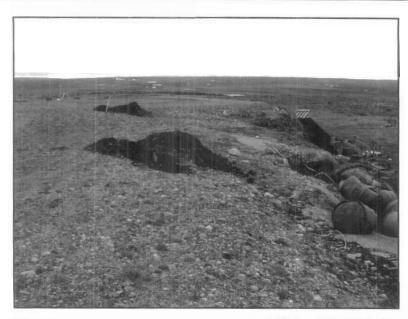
Escarpment north of POL Tank Testpits ET86 and ET87, looking west
